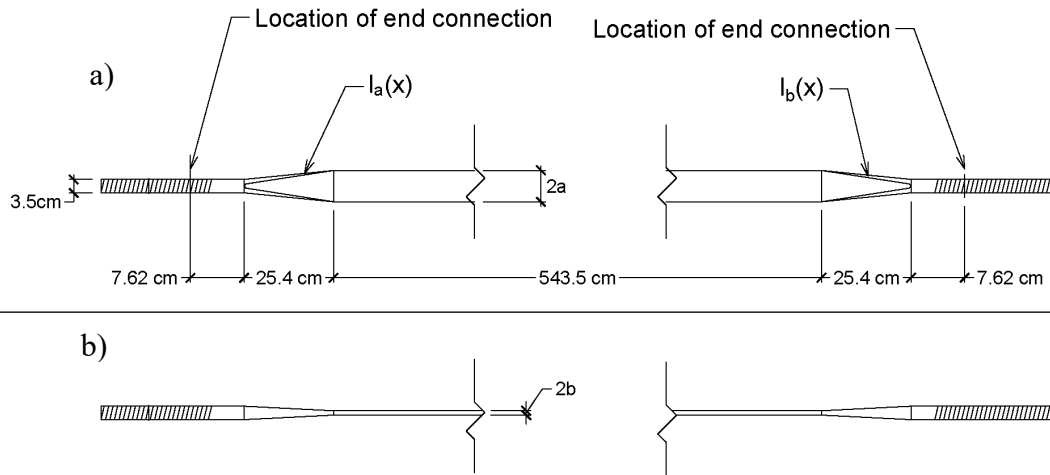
Scale model diagonal specimens used in this test. a) Plan view showing the wide face of the rectangular cross-section. b) Plan view showing the narrower face of the rectangular cross-section
